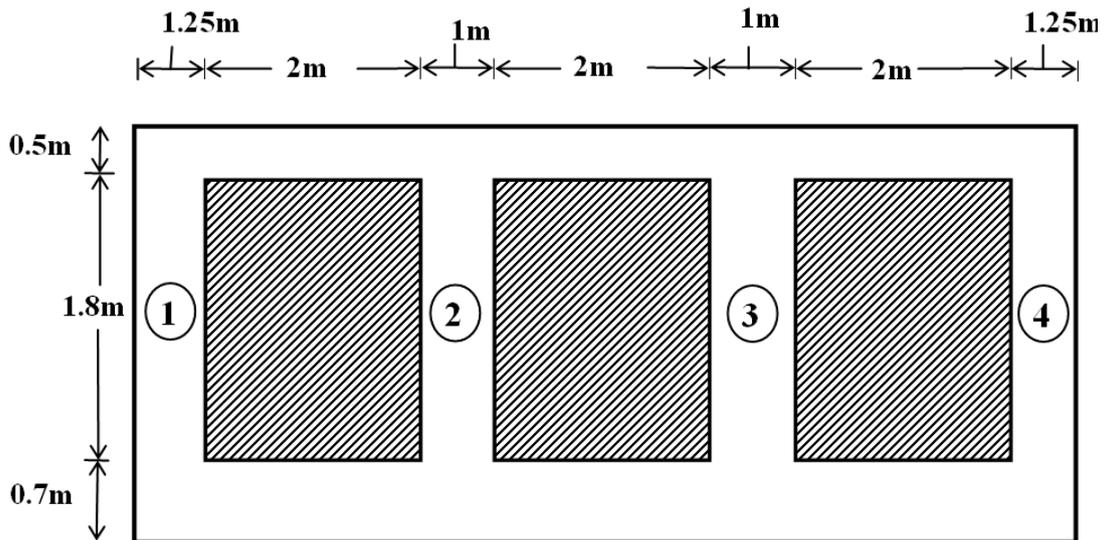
Section of end wall at 2nd, 3rd and 4th storey
